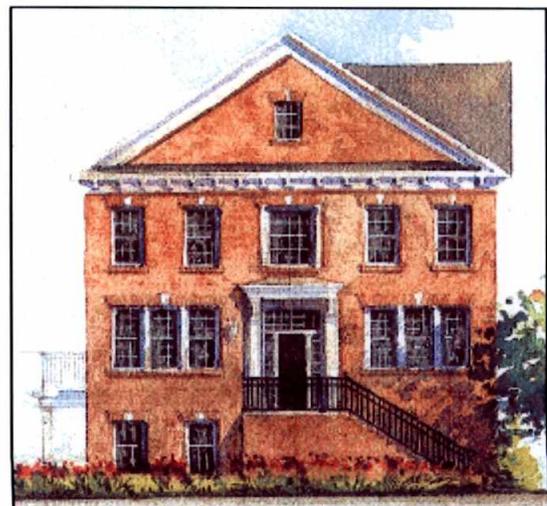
The side elevation of the townhouses from Sheet 9 of the GDP. (Source: Dominion Surveying Inc., 2011)
